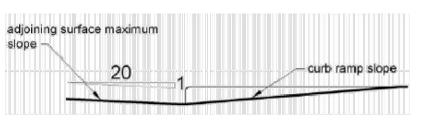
Counter Slope of Surfaces Adjacent to Curb Ramps
